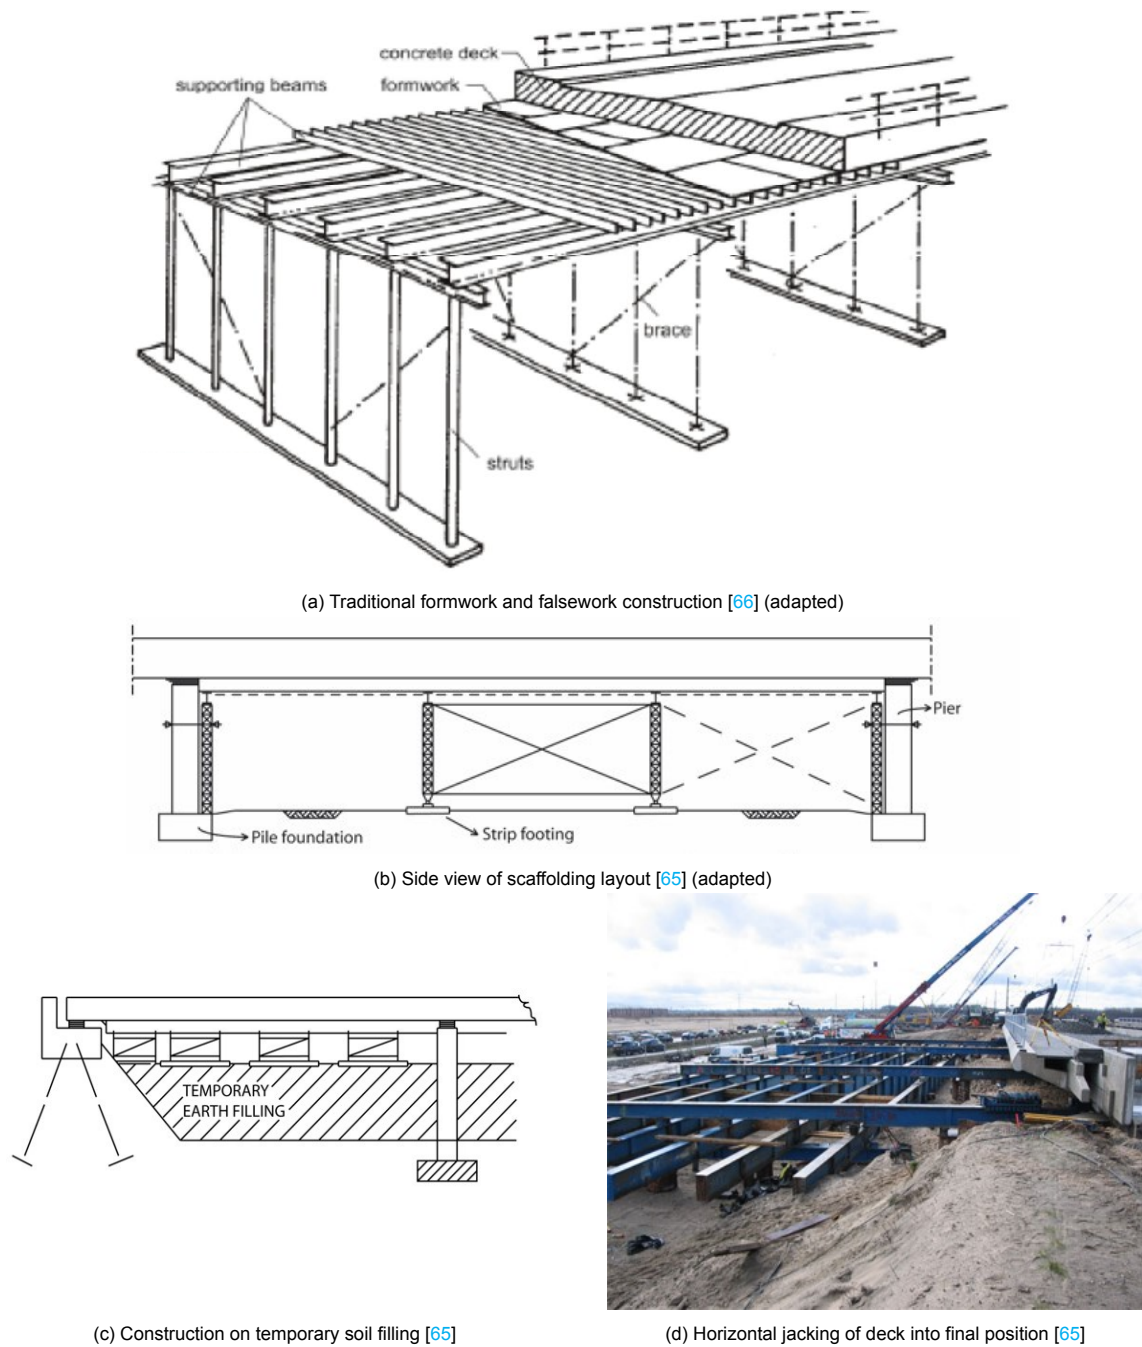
Examples of execution methods for cast in-situ viaducts
